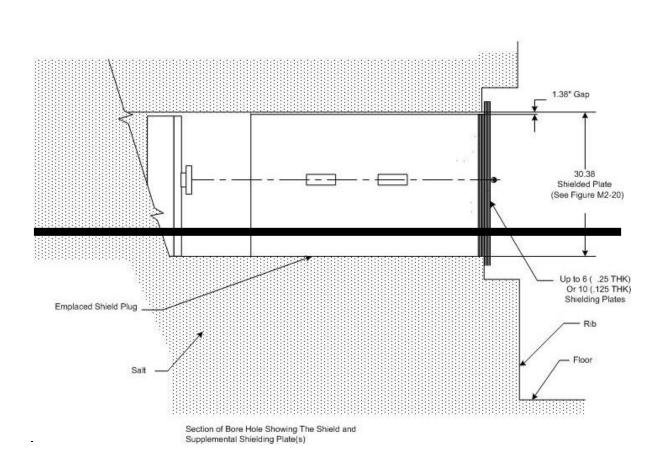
Shield Plug Supplemental Shielding Plate(s)
